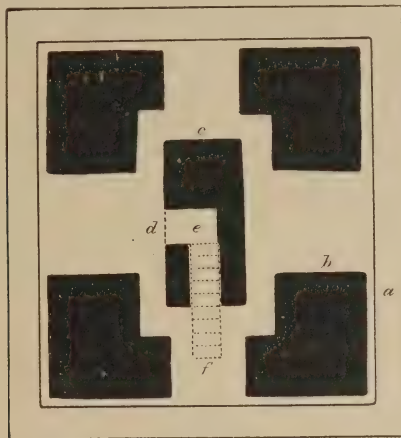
GROUND PLAN OF FIRST STORY OF TOWER.
